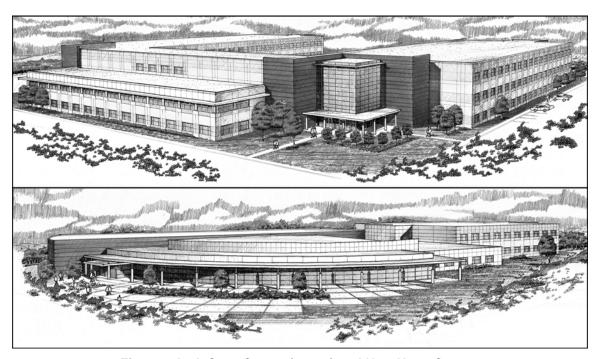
Jack Case Center (upper) and New Hope Center.
